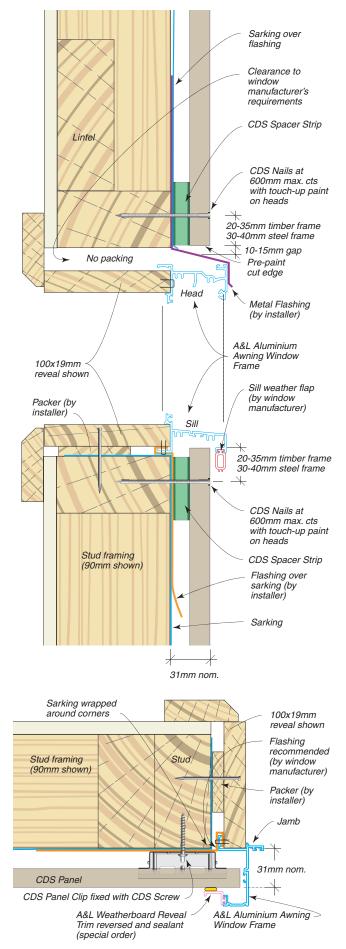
Typical Detail Junction with Fibre Cement Cladding System – Plan View
